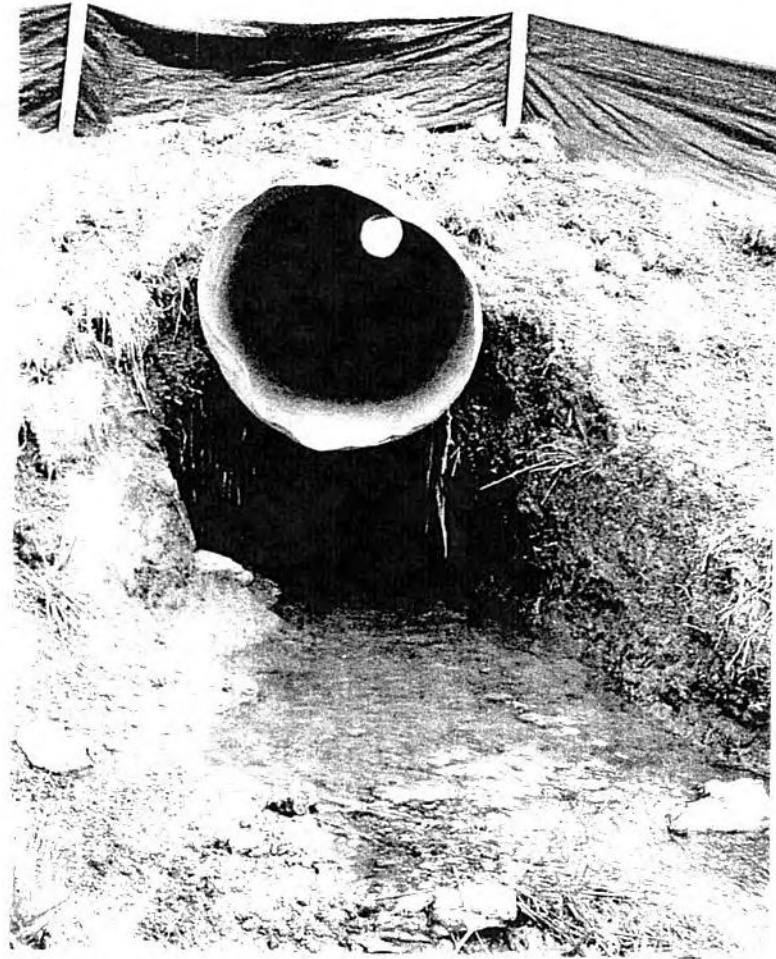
Outlet structure from lower pond showing a breach of the outlet structure beneath it.
